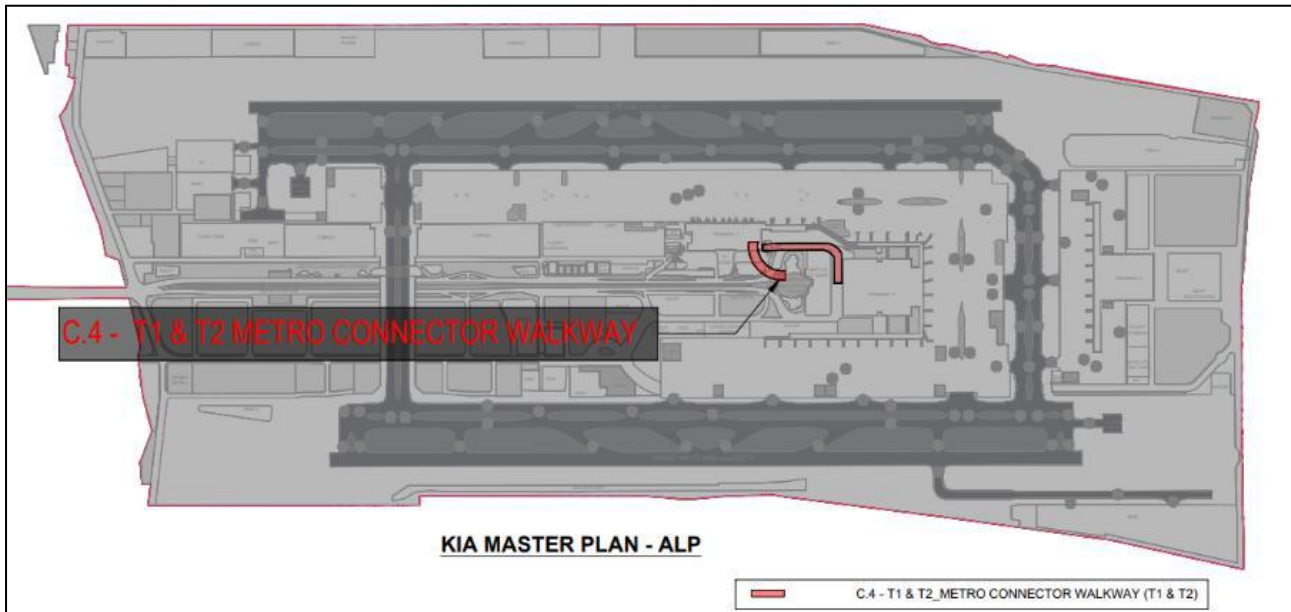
Locations of the Proposed T1 & T2 Metro Connector Walkways
